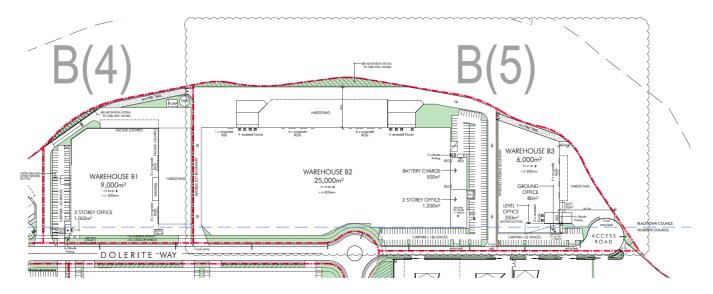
QuarryWEST Precinct B Site Plan - As Proposed
